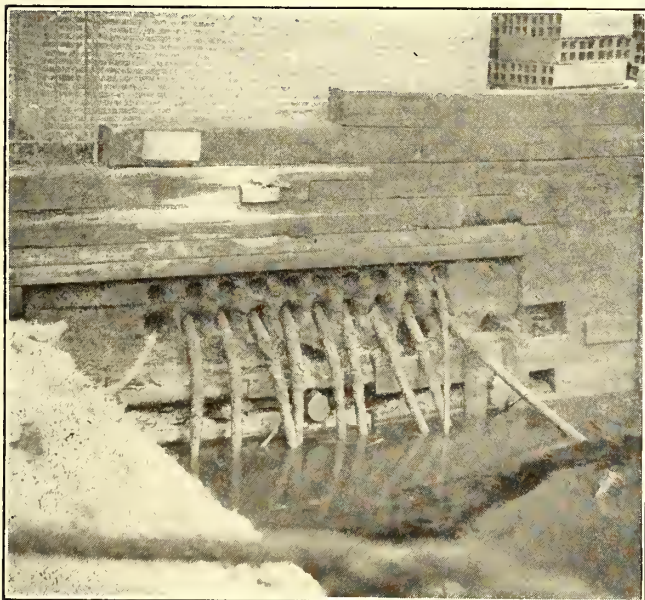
Harlem Cables—West Cable House, Showing Duct Entrances
